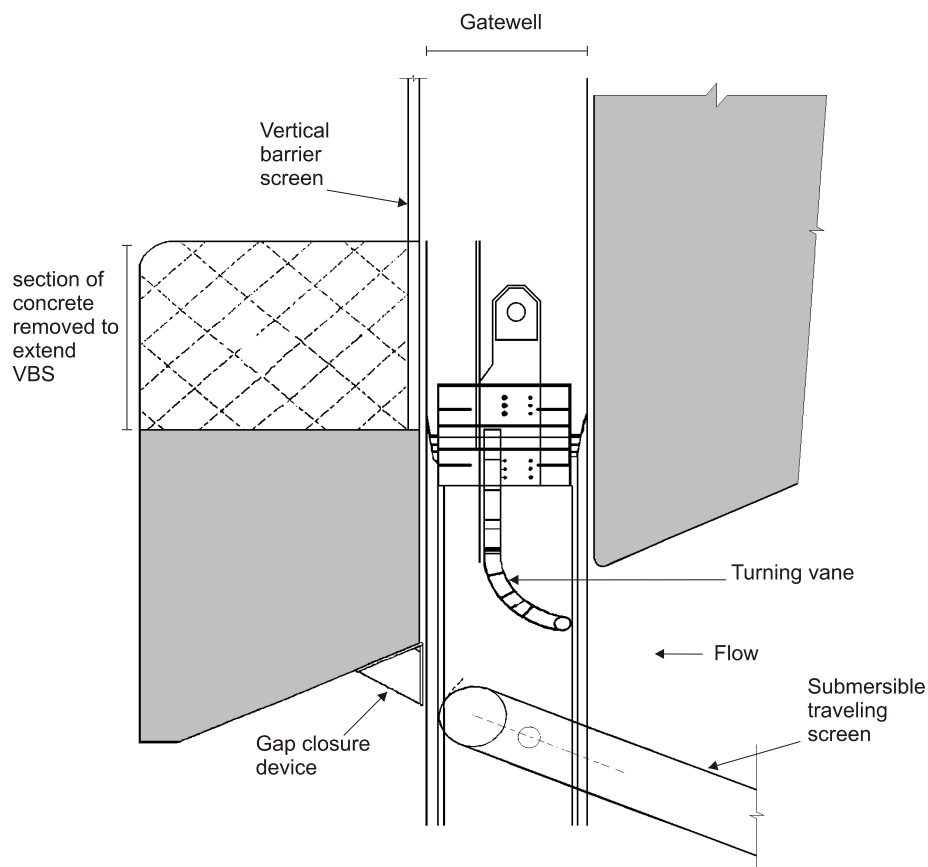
Cross section of unit 15 at Bonneville Dam Second Powerhouse showing the three modifications evaluated in 2002: 1) removal of a section of concrete beam to allow for a longer vertical barrier screen, 2) installation of a turning vane, and 3) installation of a gap closure device.
